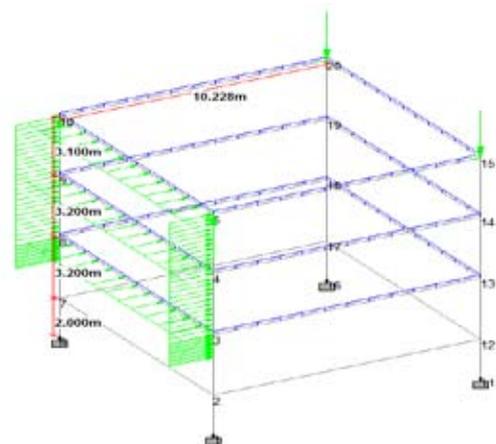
STADD model of column and tie beams for 9.5 m RC.
